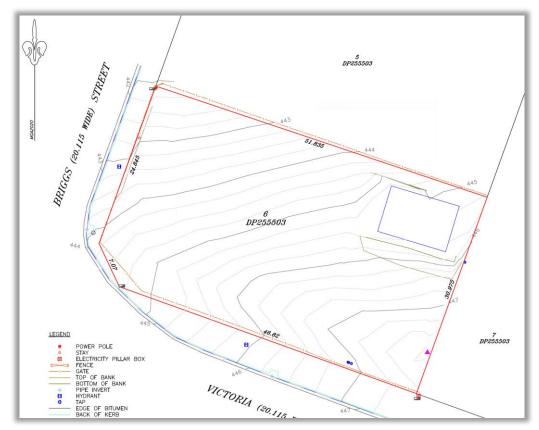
Cadastre & Contour Plan (source NSW SIX Maps)
